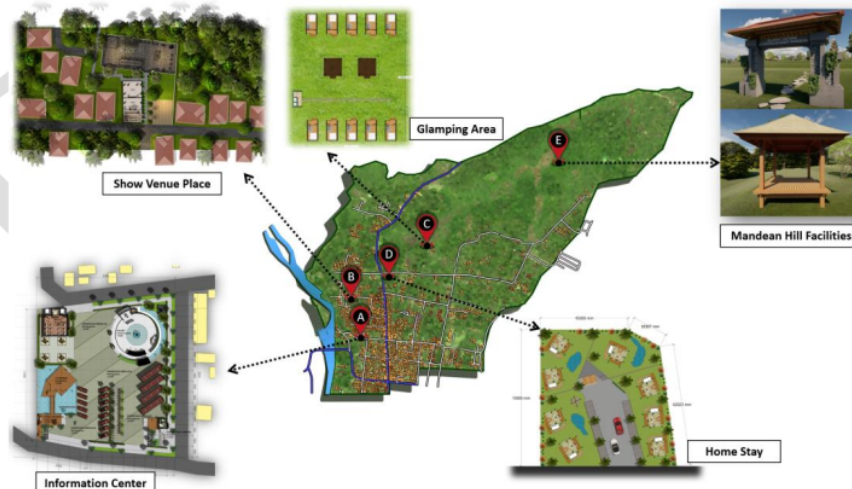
Paksebal Tourism Village Development Master Plan Planning
